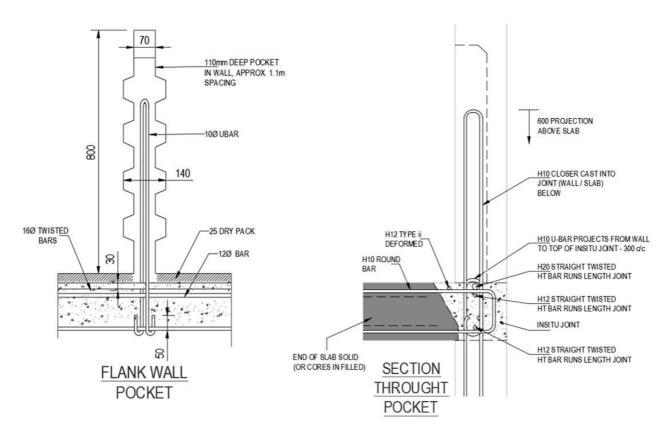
Example of insitu joint between Flank Walls and Floor Slab
